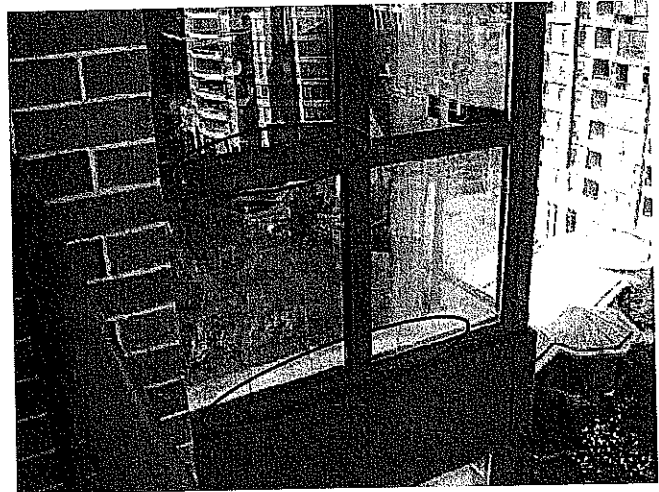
Corner glazed punch window assembly. Red ellipse shows locations of smoke leakage during air leakage testing at suite 901.
